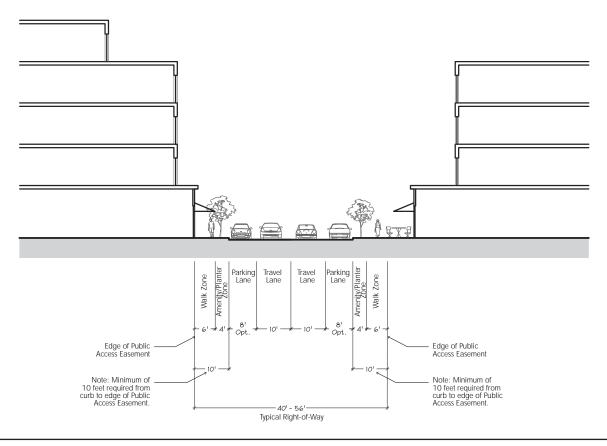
Typical Flexible Connection with Vehicle Access Section (H-H)
